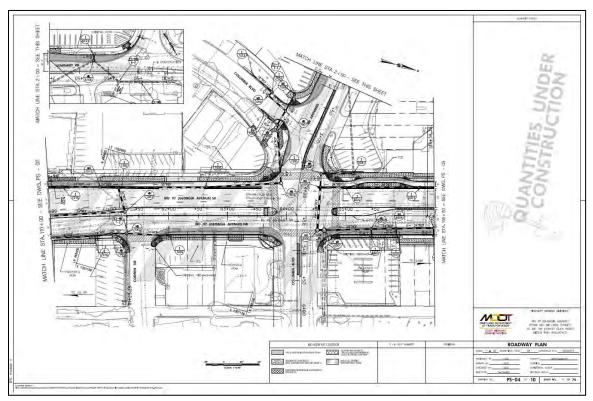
Plan View – Georgia Avenue at Columbia Boulevard/Seminary Road
